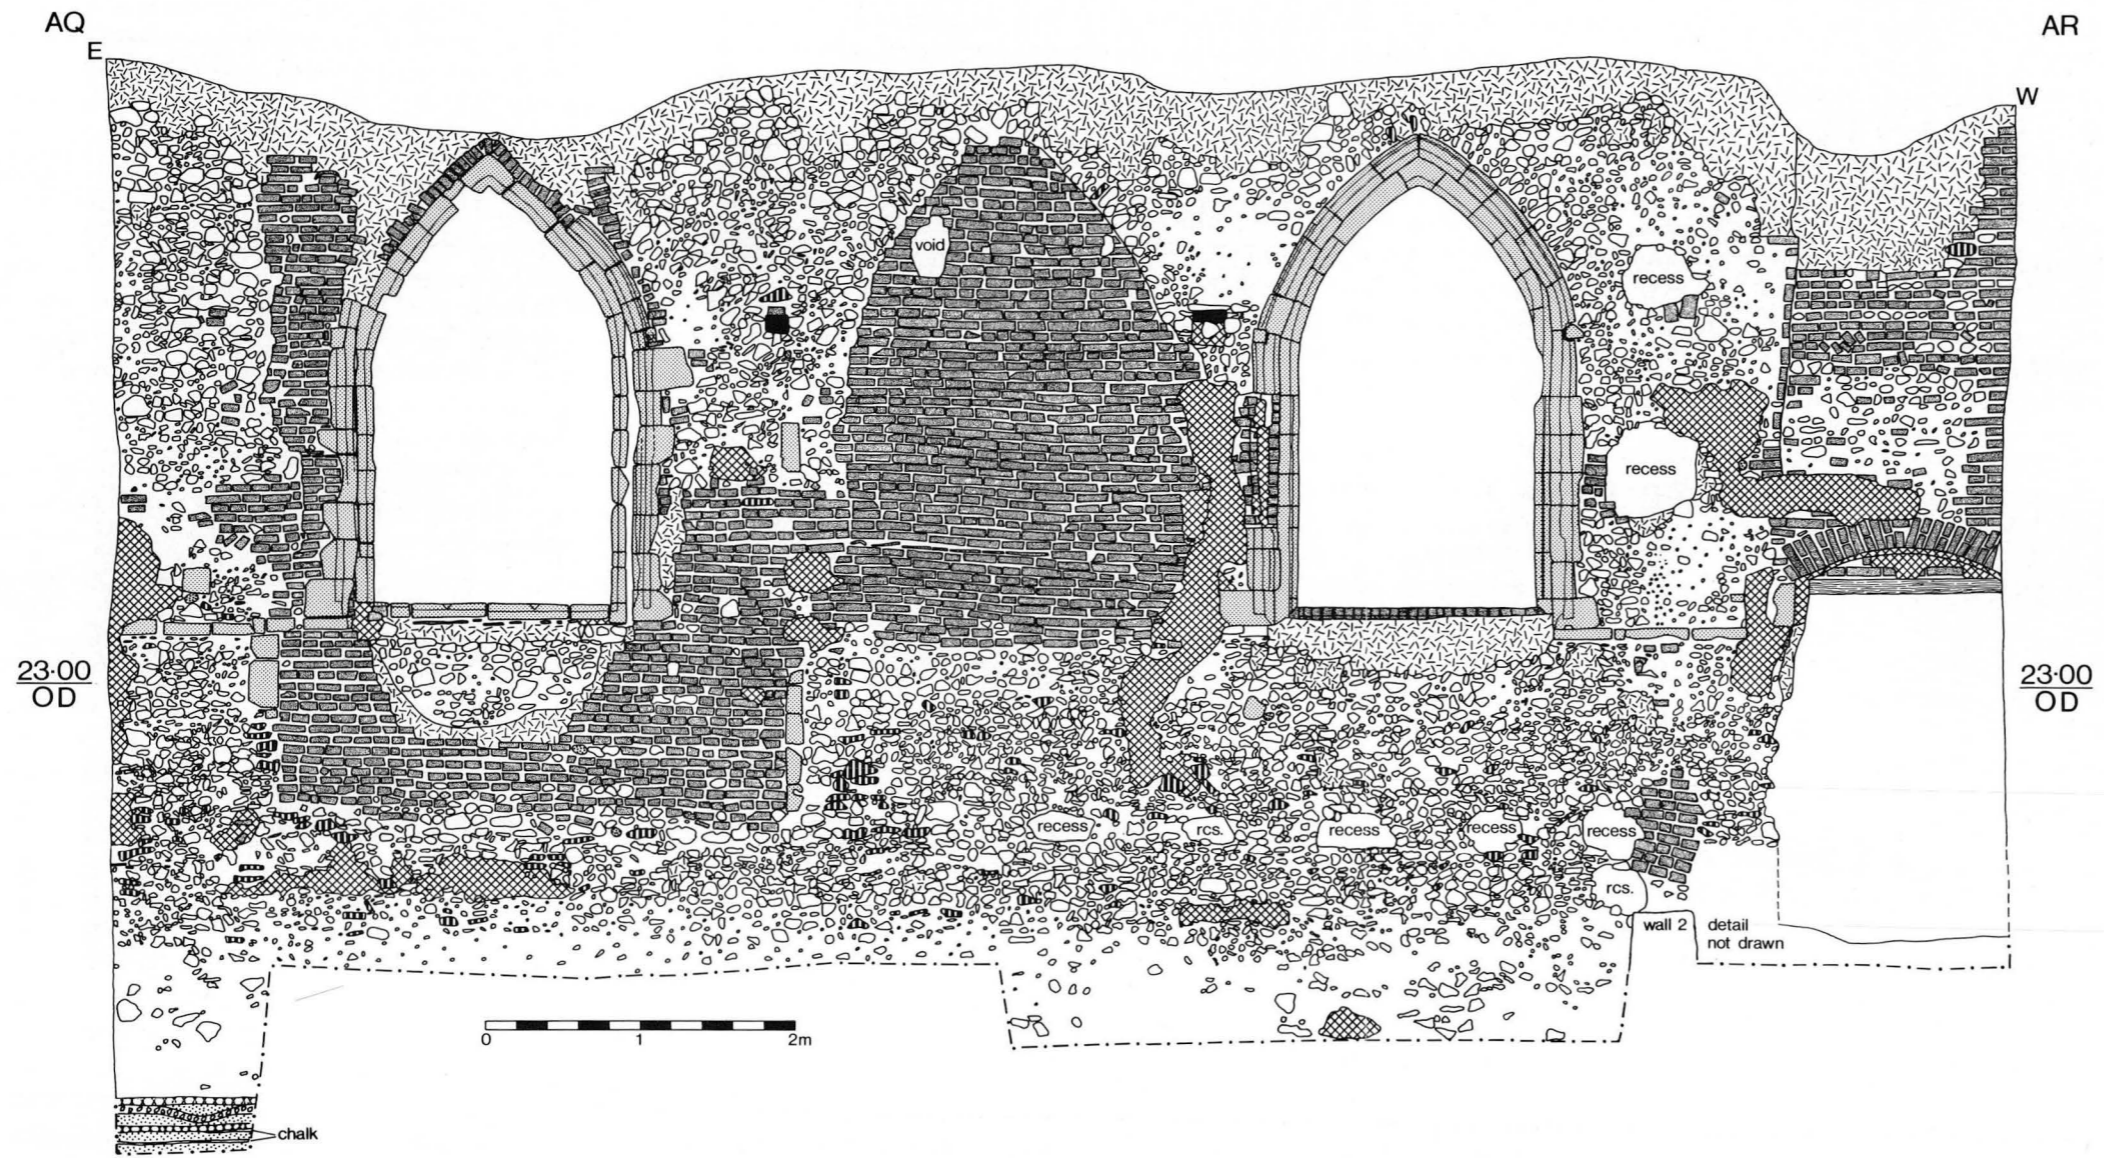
Elevation AQ-AR of interior south wall of the chancel. Scale 1:50
